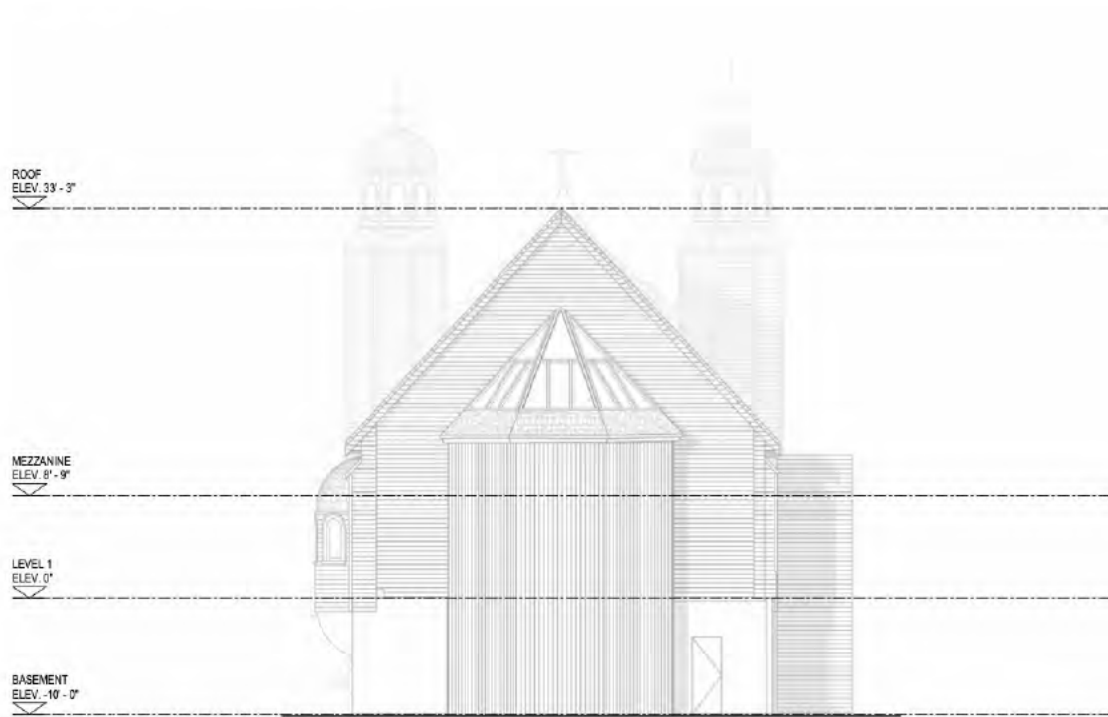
1102 Purcells Cove Road – Rear Elevation
